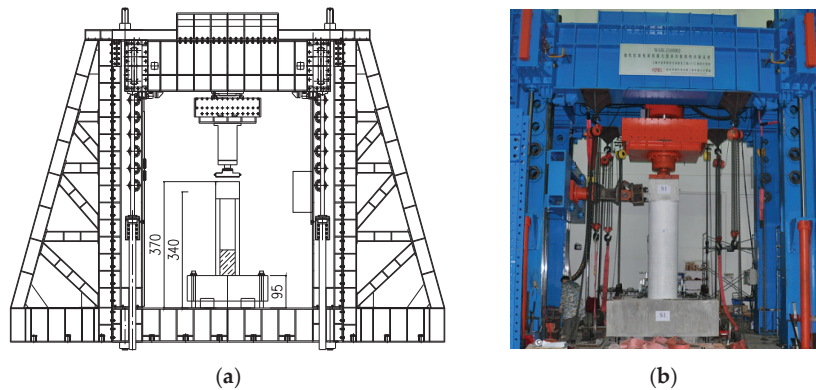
Loading device. (a) Loading schematic; (b) loading photo.
